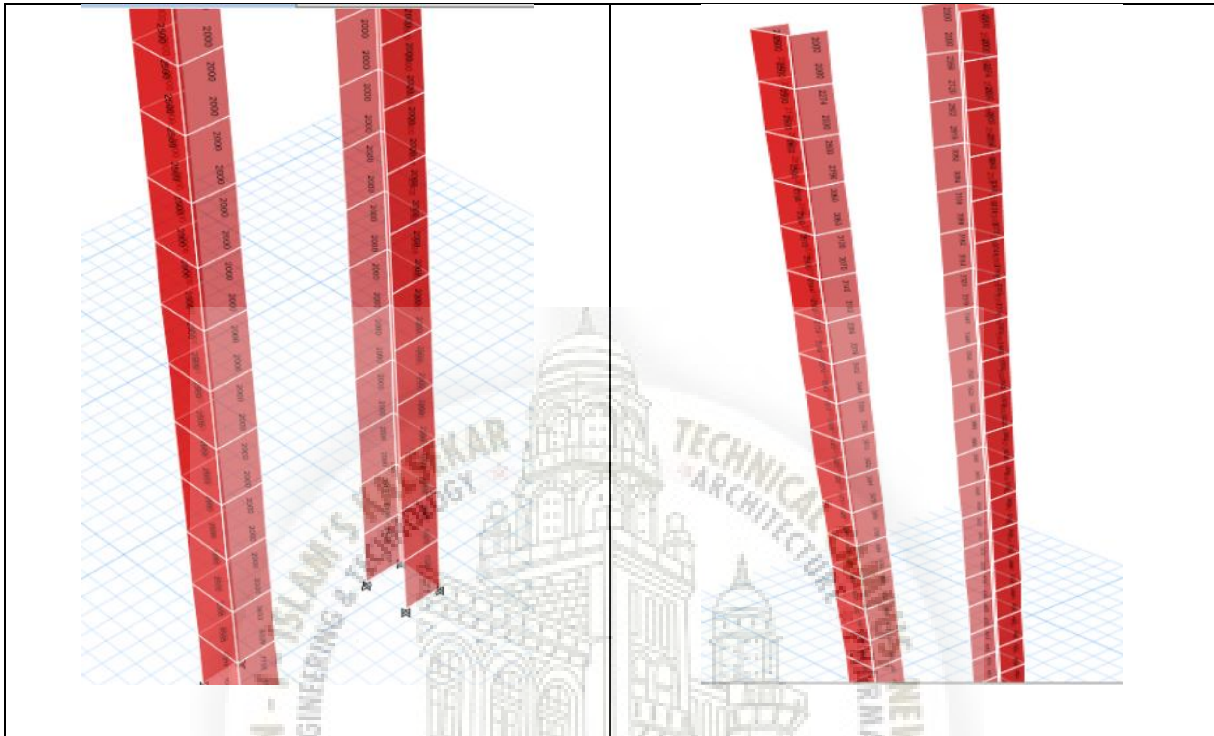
Shear Wall Design Due To Dead Load and Auto-Sequence in load combination
